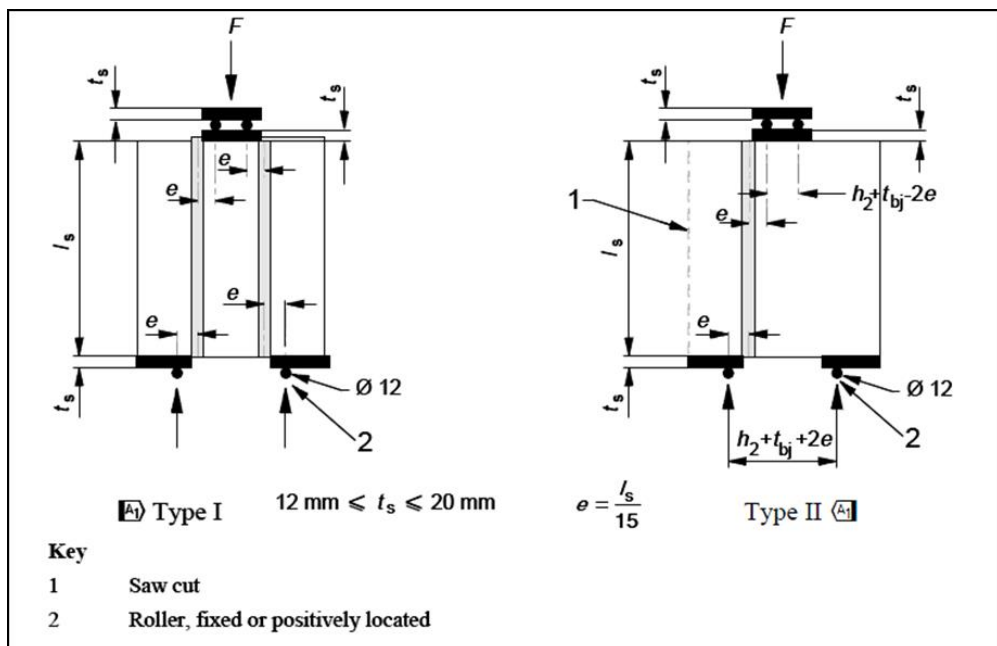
Loading of shear specimen (EN 1052 – 3).
